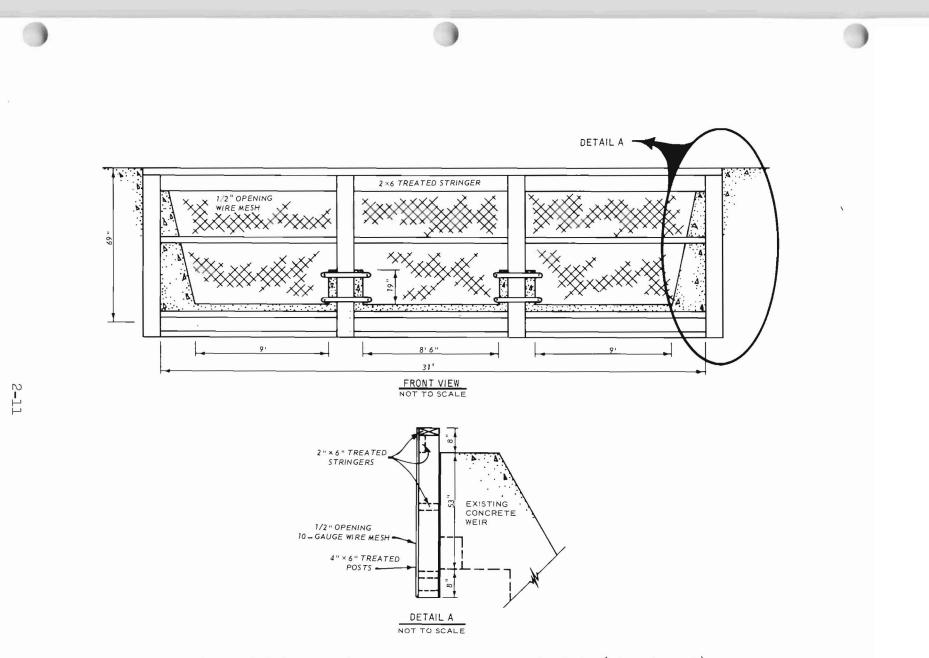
Barrier system at Lake Mare Prairie (structure 3)
